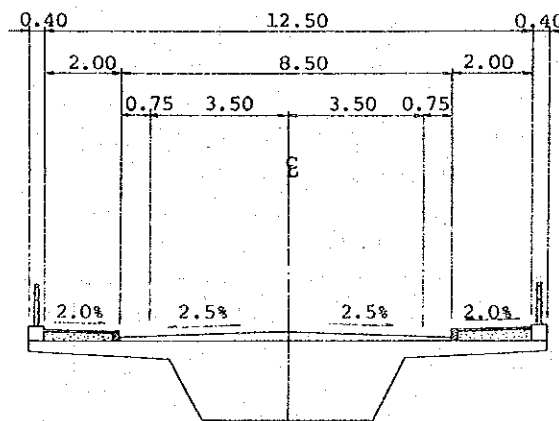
WIDTH OF BRIDGE (Unit: m)
